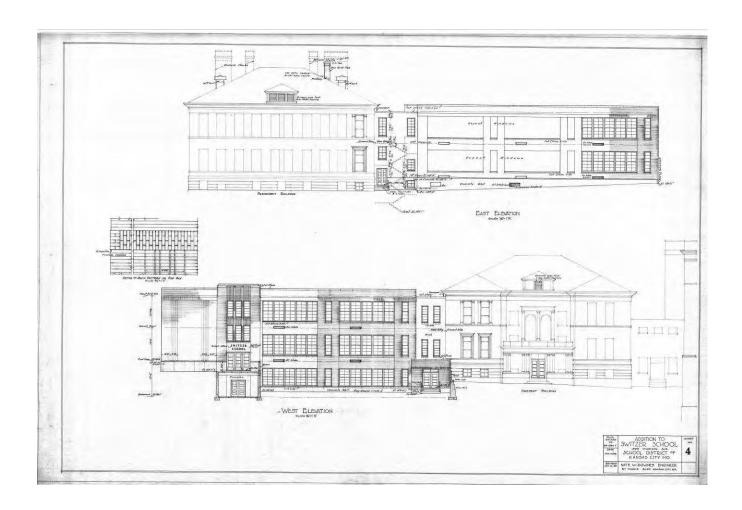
Addition to Switzer (South) 1939: East and West Elevations PWA No. MO 1584 F
